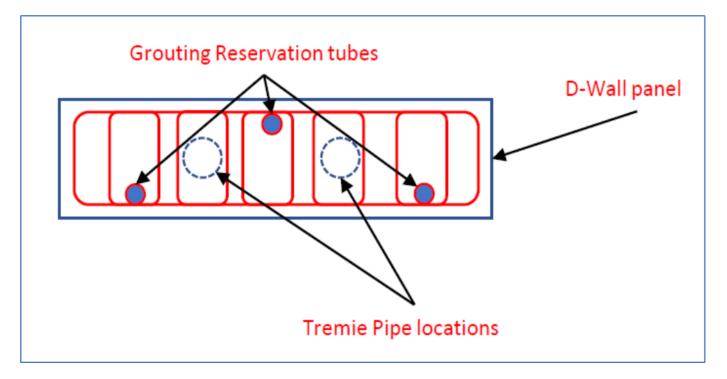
Grouting Reservation Tube layout in a Diaphragm Wall Panel
